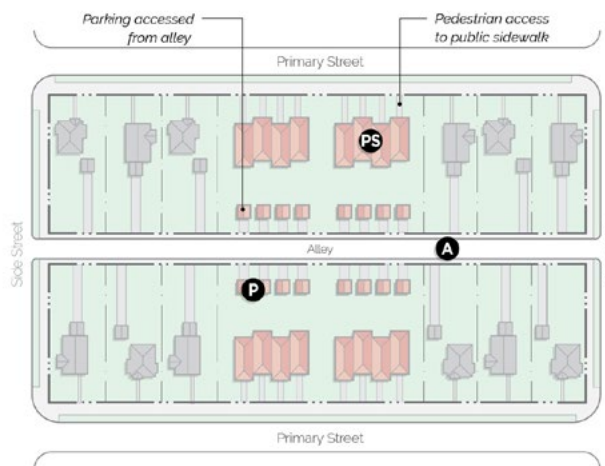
End of block versus mid-block townhouse parking standards (Prepared by Houseal Lavigne)
